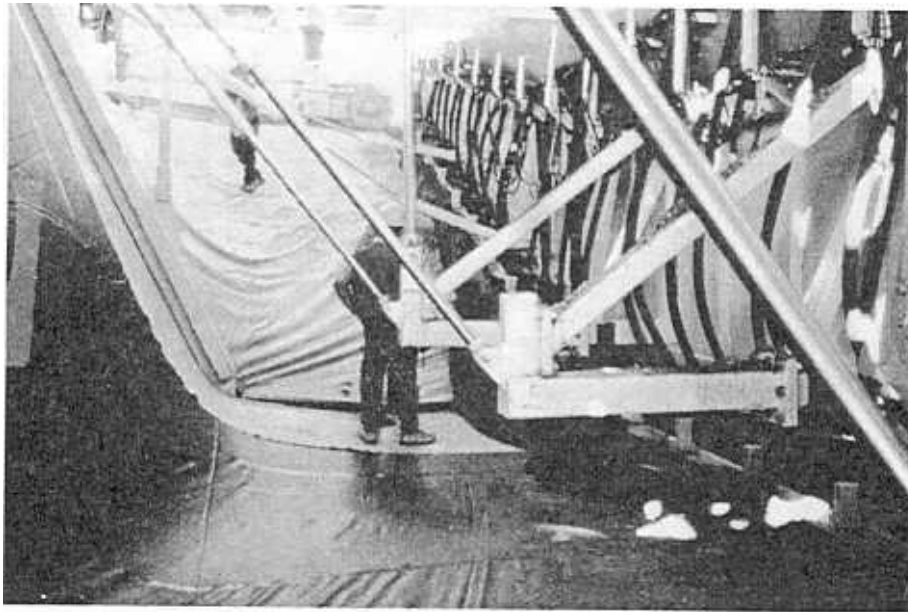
View under lining machine showing geotextile and PVC on the 2.5:1 side slopes. Slip form paver is located at right side.
